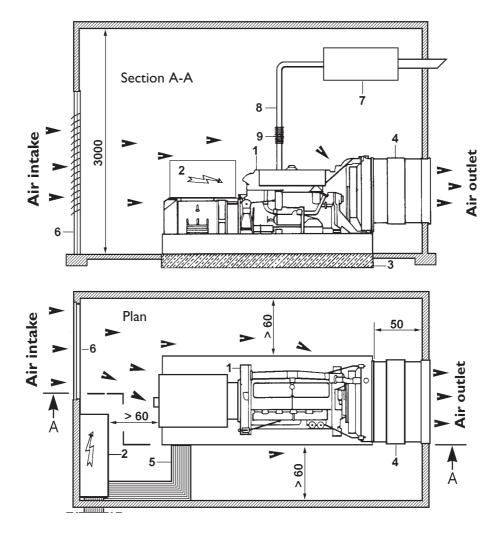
A Plan and section of a typical indoor installation - Air flows.
